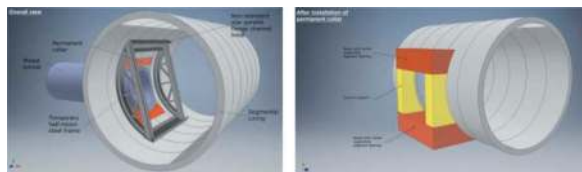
Support for tunnel opening. left: temporary right: permanent.
